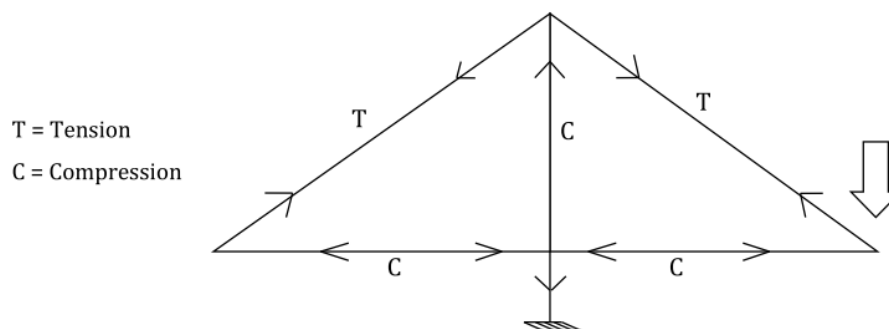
Force system of a cable-stayed bridge (Olamigoke 2017)
